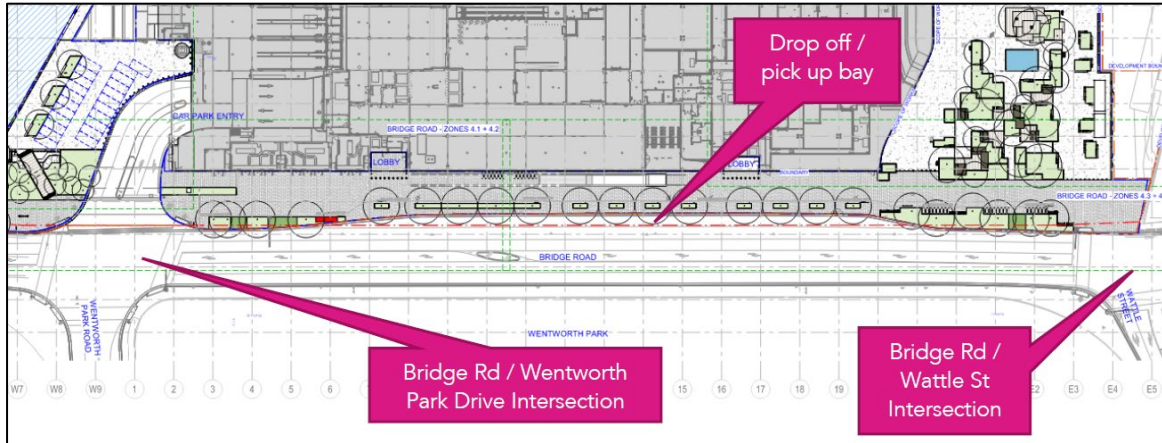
Bridge Road pick up and drop off zone – as per original approval
